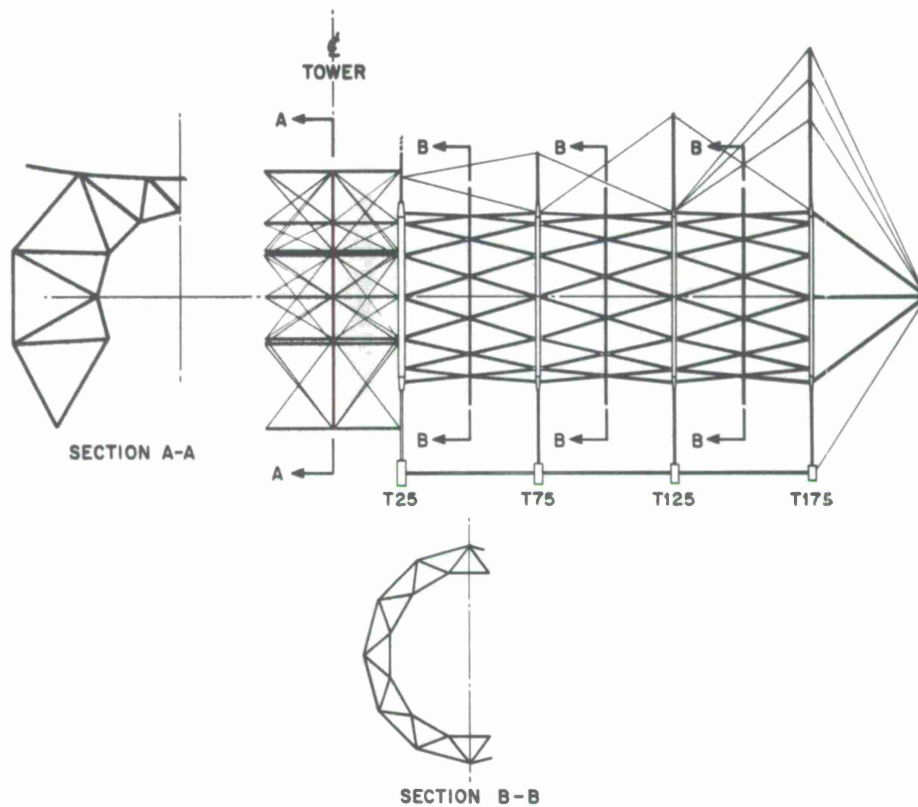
Outline drawing of torque tube for Hammerhead antenna.
